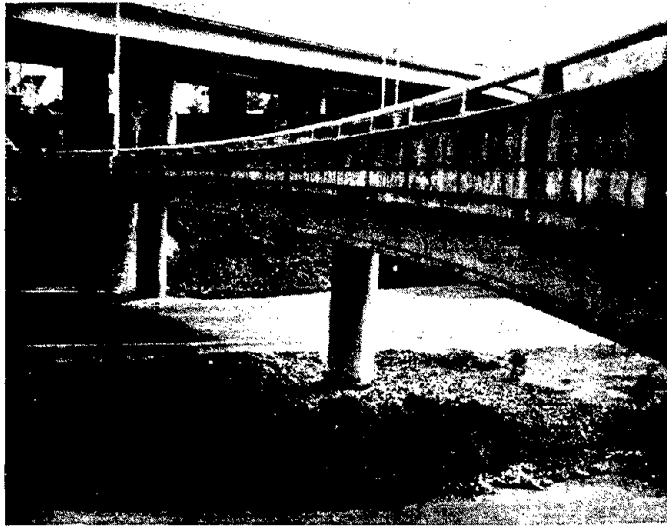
View of side of curved concrete box girder bridge shown in figure 12 showing no signs of distress in spite of the settlements that took place.
